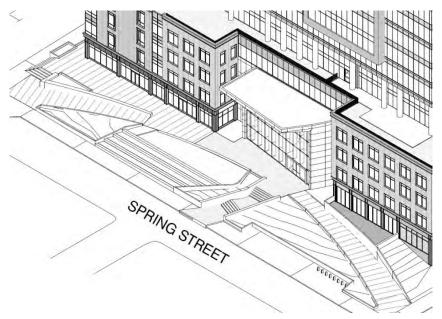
Proposed Elevated Area to the South of the Redeveloped Building (Build)
